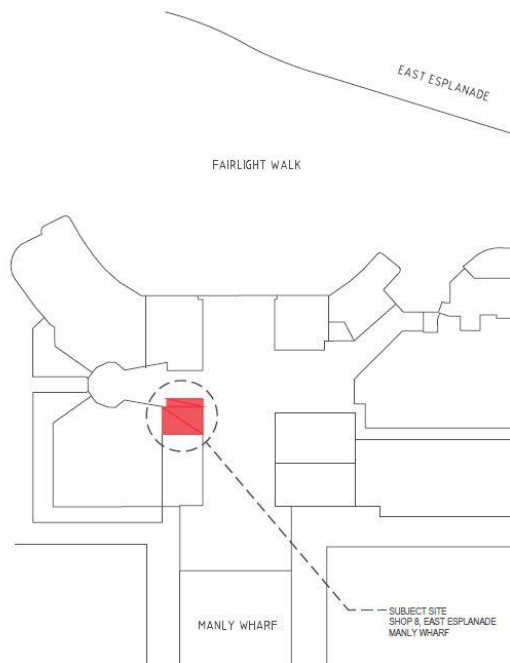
Section of Site Plan of subject site showing it is not visible from Fairlight Walk or East and West Esplanade. (Source: Avance Design 2022)
